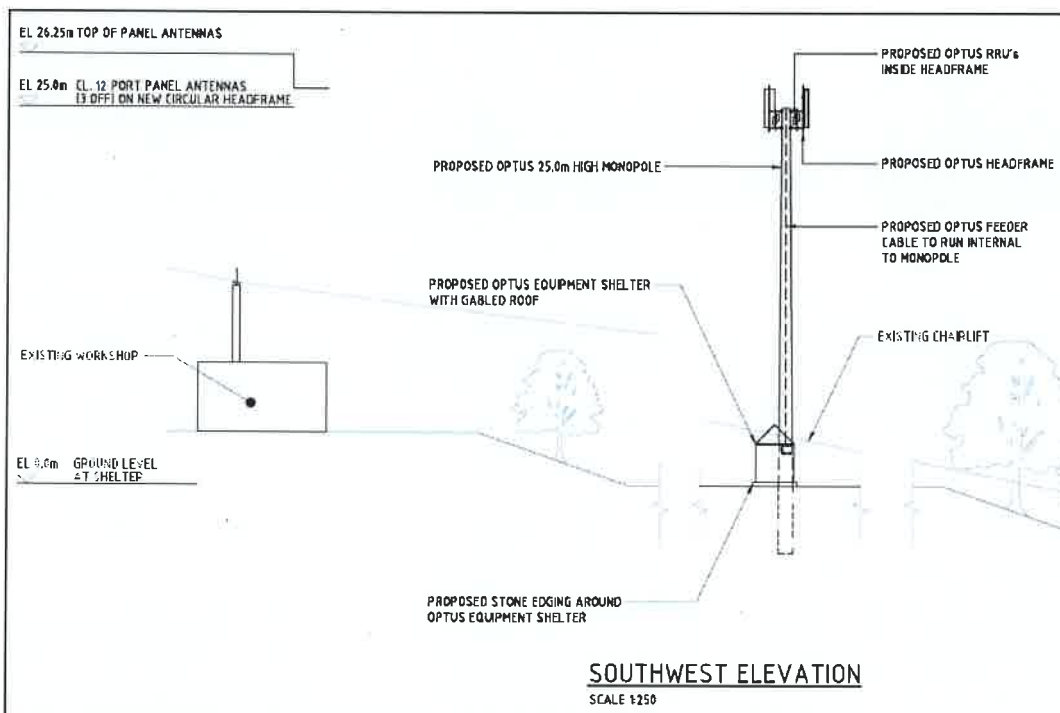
Draft Site Layout Elevation Extract (Source: Catalyst ONE)
